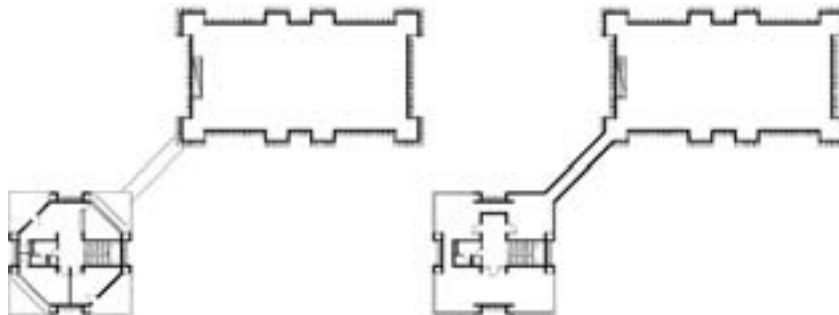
Georgi Konstantinovski (1974-1979). Archive in Ohrid: Ground floor plan and First floor plan.
